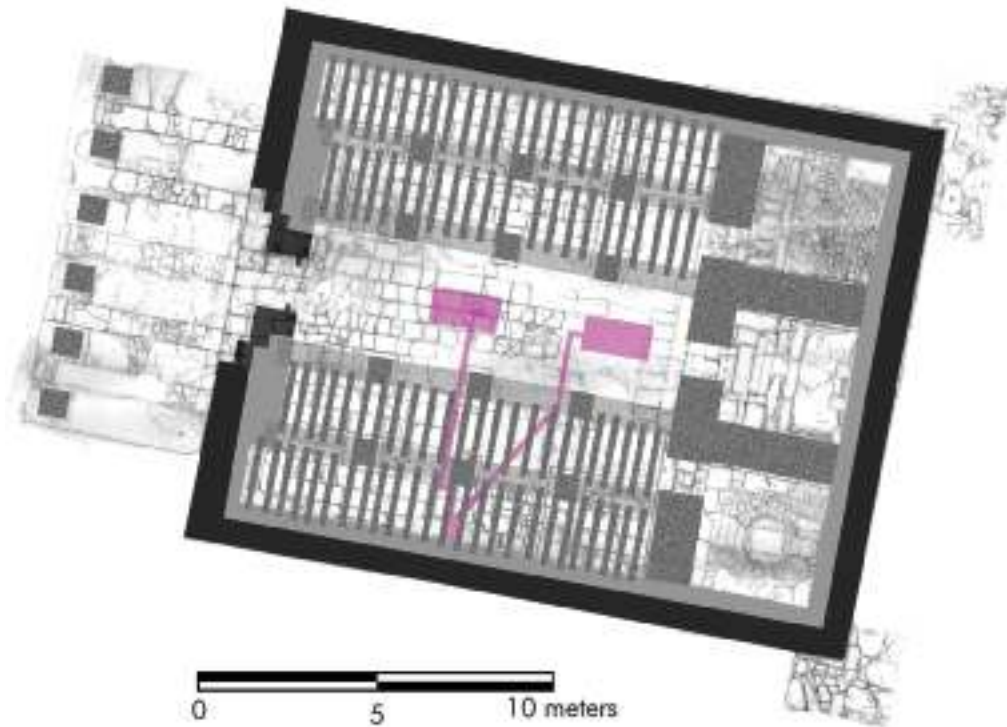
Reconstruction of the first and the second order of the ceiling beams in the ground plan.
